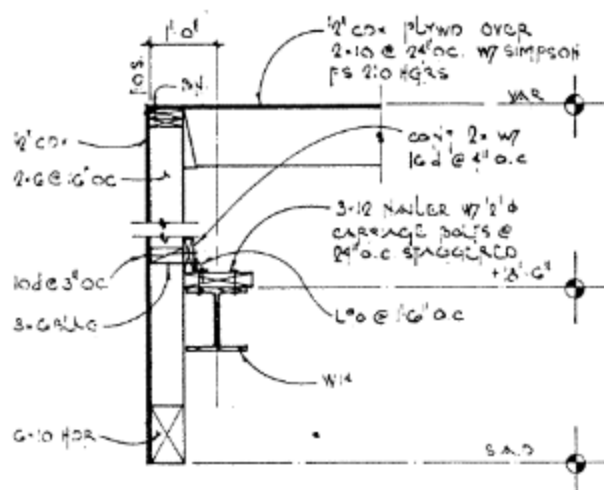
Diaphragm Attachment to Shear Wall Through Ledger
